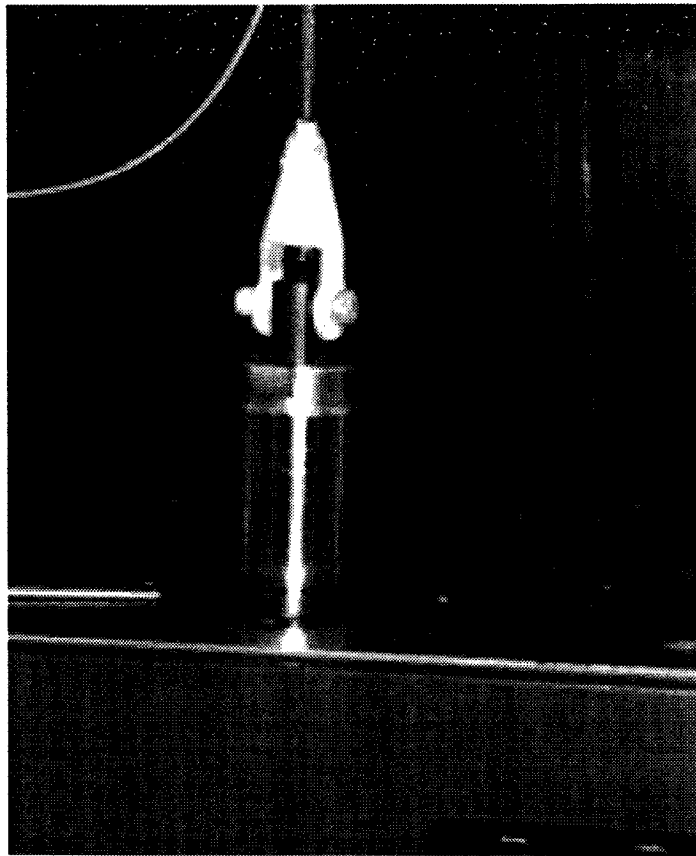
Spelter socket attaching the lower end of a pultruded carbon tendon to an Instron machine
